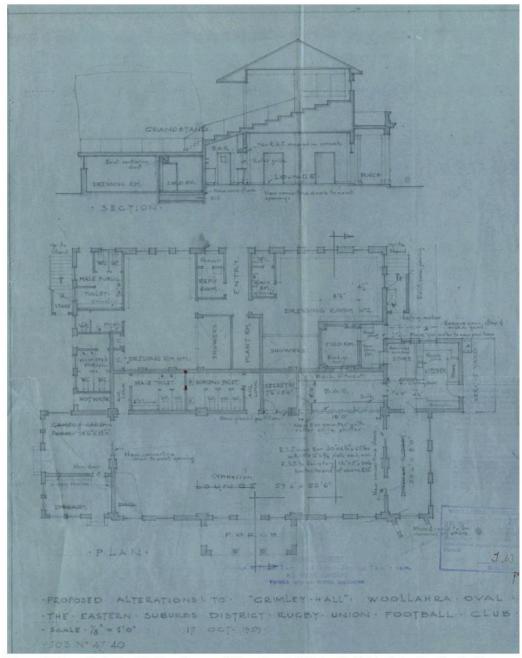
Davey, Brindley & Vickery, Proposed Alterations to 'Grimley Hall', Woollahra Oval for the Eastern Suburbs District Rugby Union Football Club, 1959 (Detail only).
